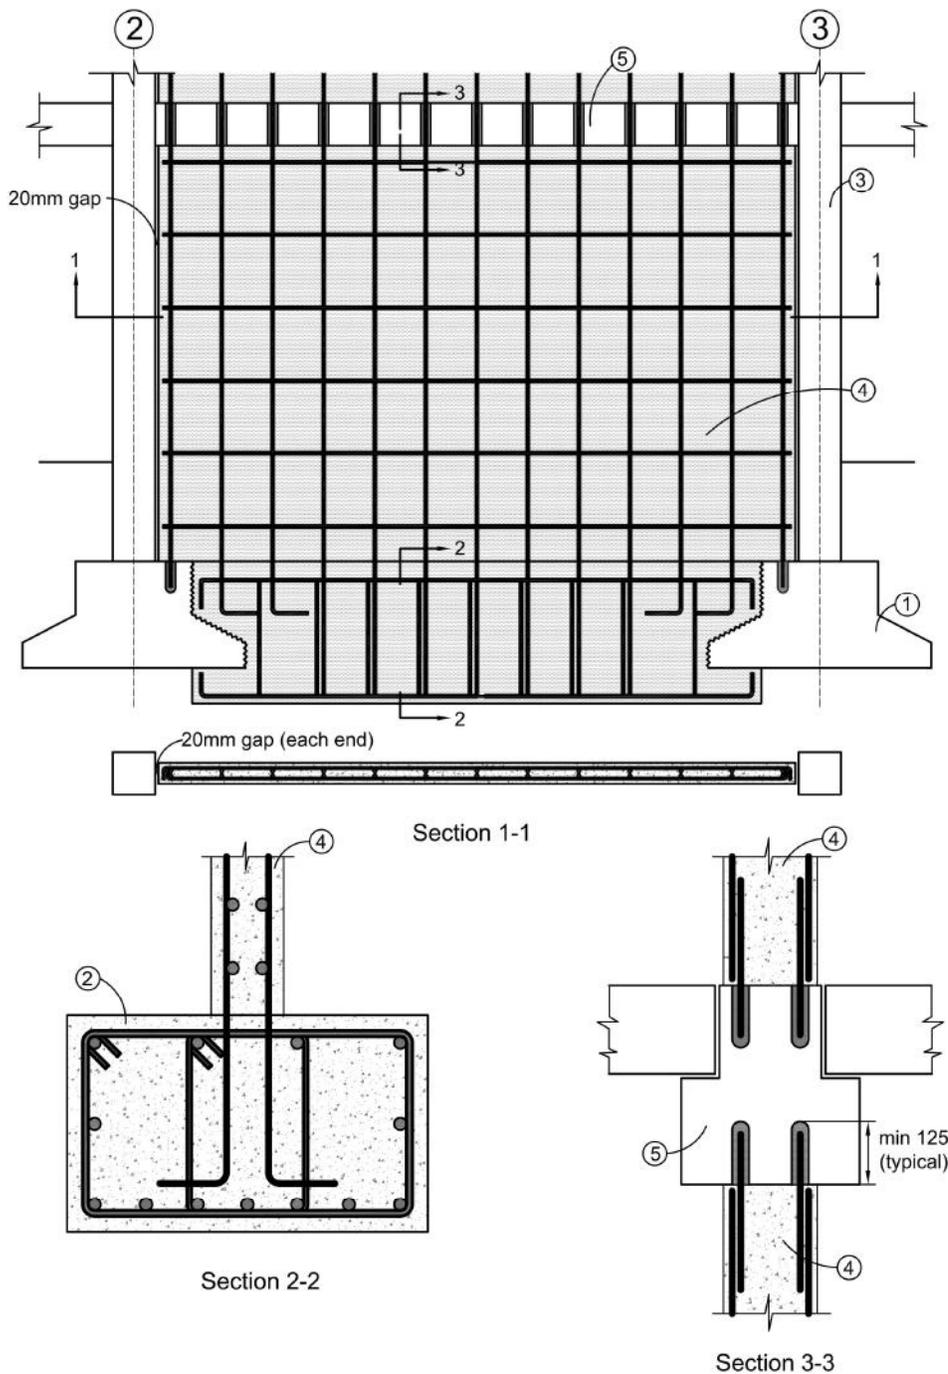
Construction details for a RC frame retrofitted with RC shear walls (RS3): 1 - existing column footing; 2 - new foundation for RC shear wall; 3 - existing RC column; 4 - new RC shear wall; 5 - existing RC beam.
